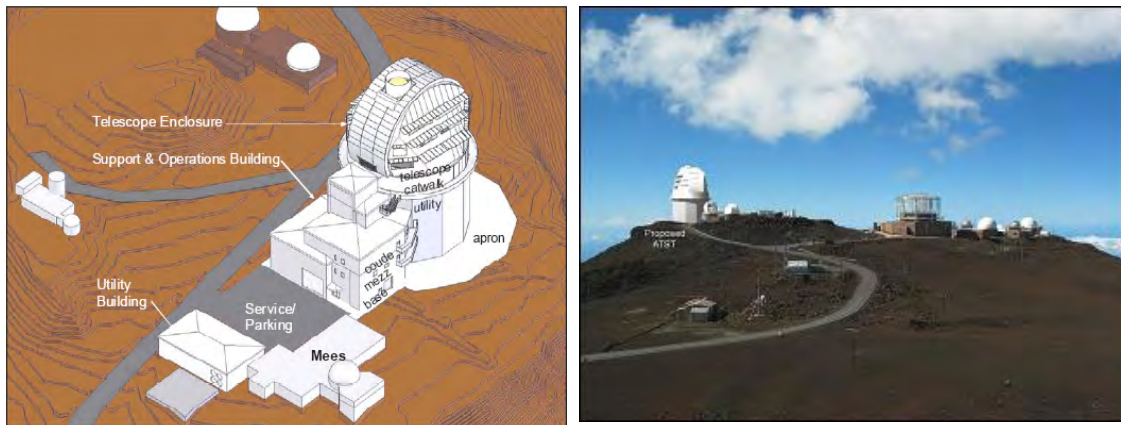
Artist's rendering of proposed ATST telescope enclosure, Support and Operations Building, and Utility Building as they will appear adjacent to several of the existing observatory buildings including the Mees and AEOS facilities. (NSF, 2006).
